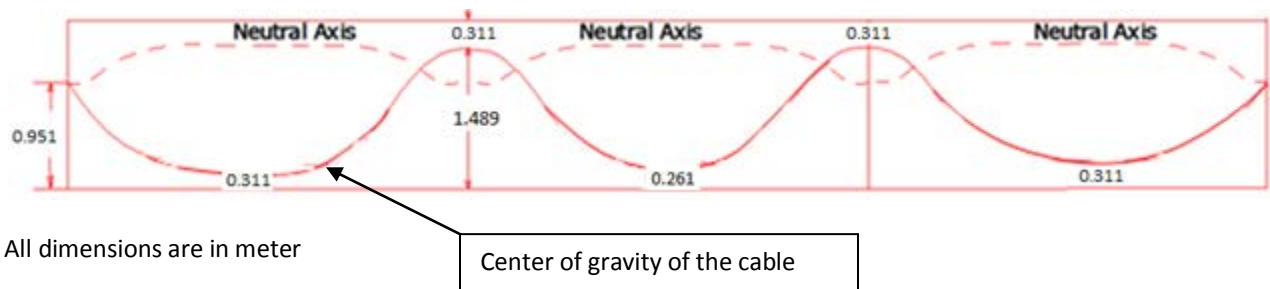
Vertical profile of the cable path for 97.758m three-span continuous box-girder
